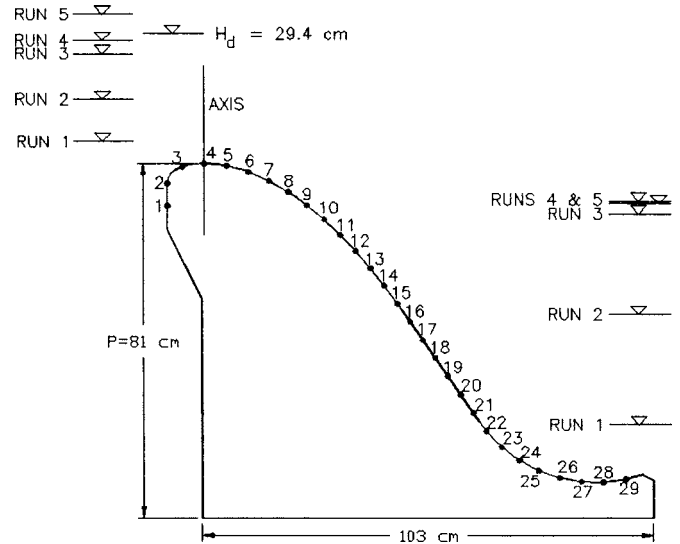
Profile of Shape A showing the location of pressure taps and headwater and tailwater elevations
